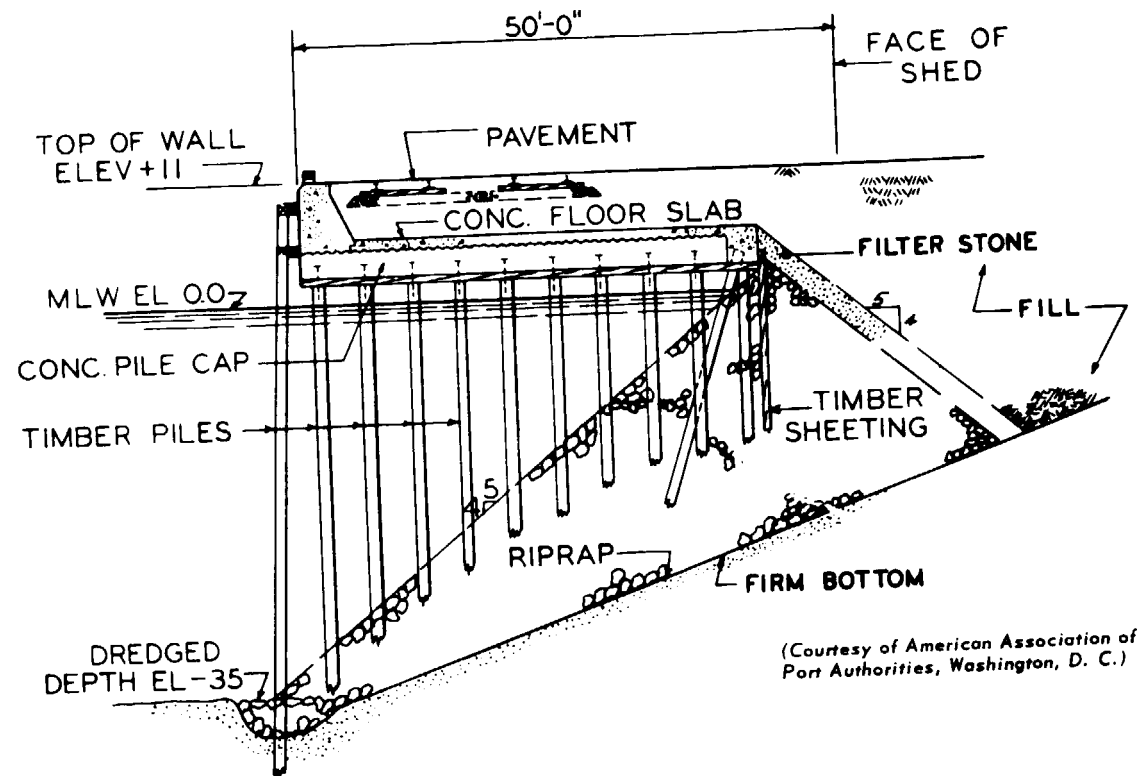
Open Type Wharf Construction with Concrete Relieving Platform on Timber Piles.
